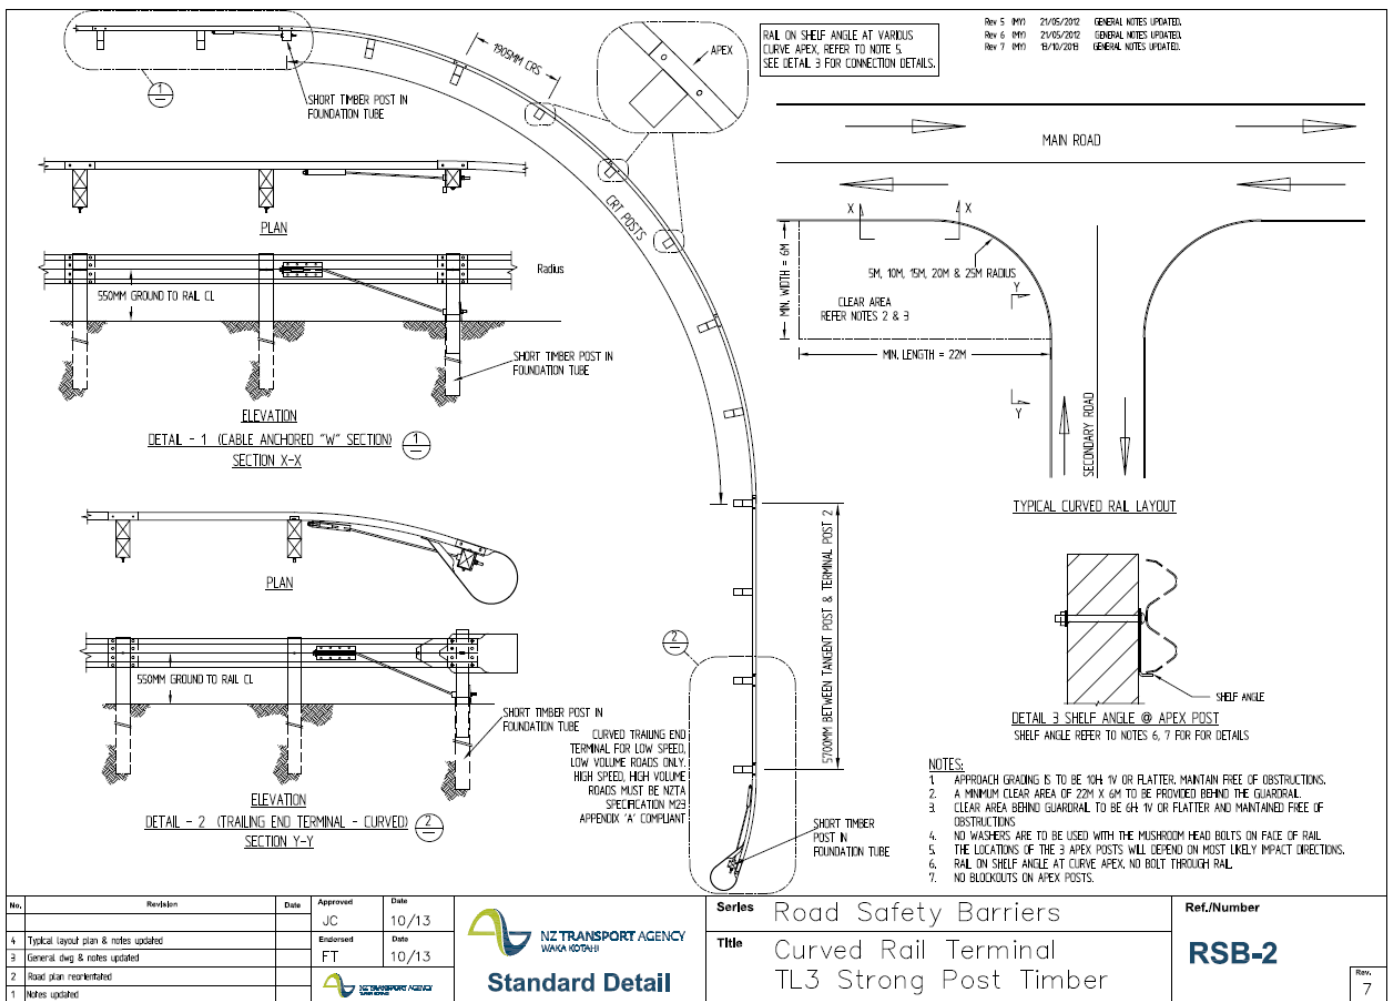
NZTA Accepted Detail for Curved W-Beam Guardrail Terminal (on Timber Posts)
